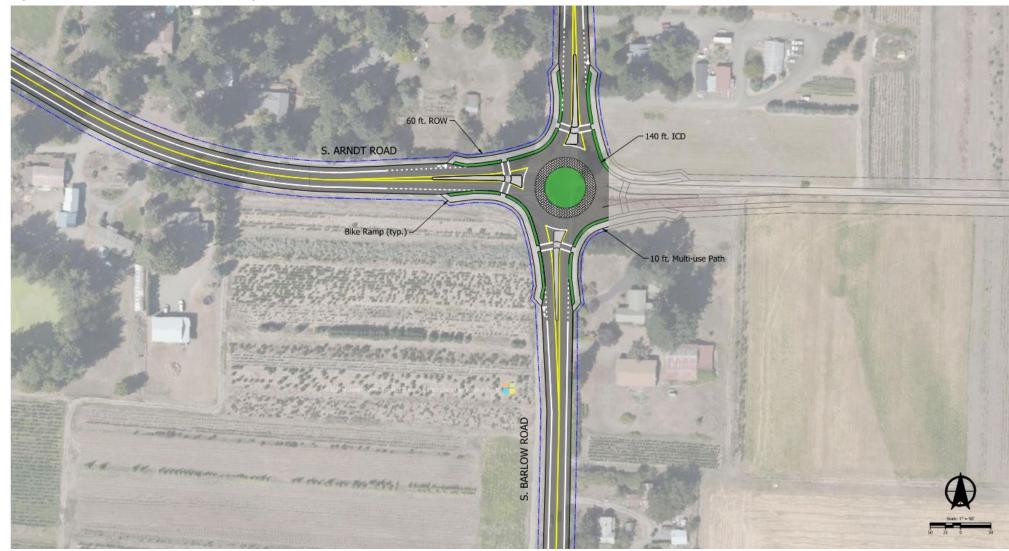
Arndt Road/Barlow Road Single-Lane Roundabout
